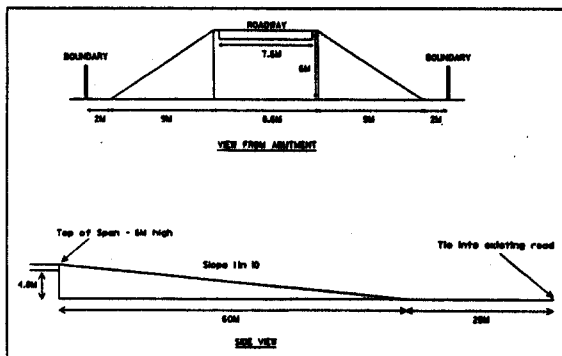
Sketch showing the road approach looking from the bridge abutment and maximum width of land take at abutment
